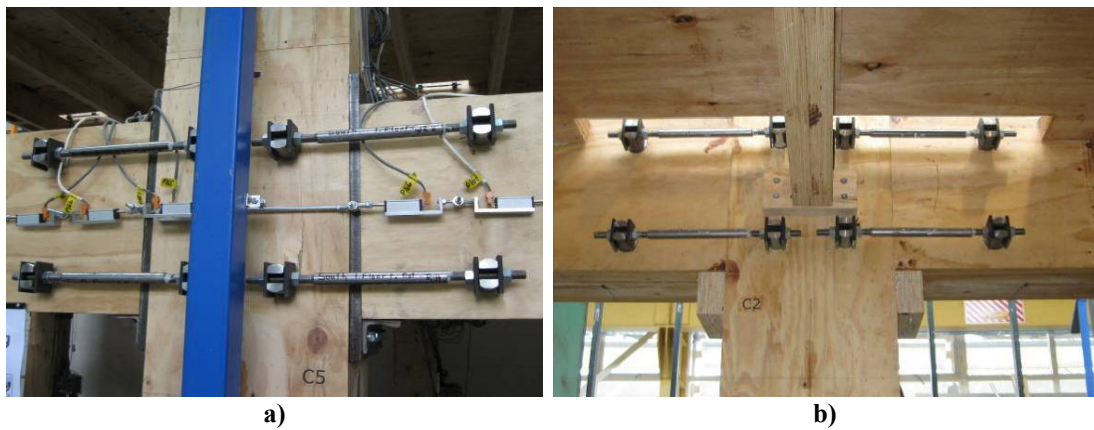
External BC connection reinforcement a) S column, L2 b) S column, L3
